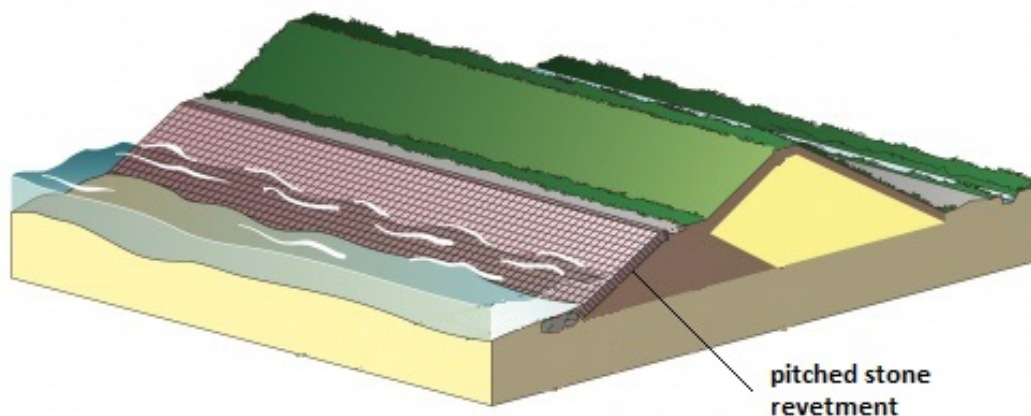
Cross section of a dike protected by a pitched stone revetment (Projectbureau Zeeweringen, 2010)
